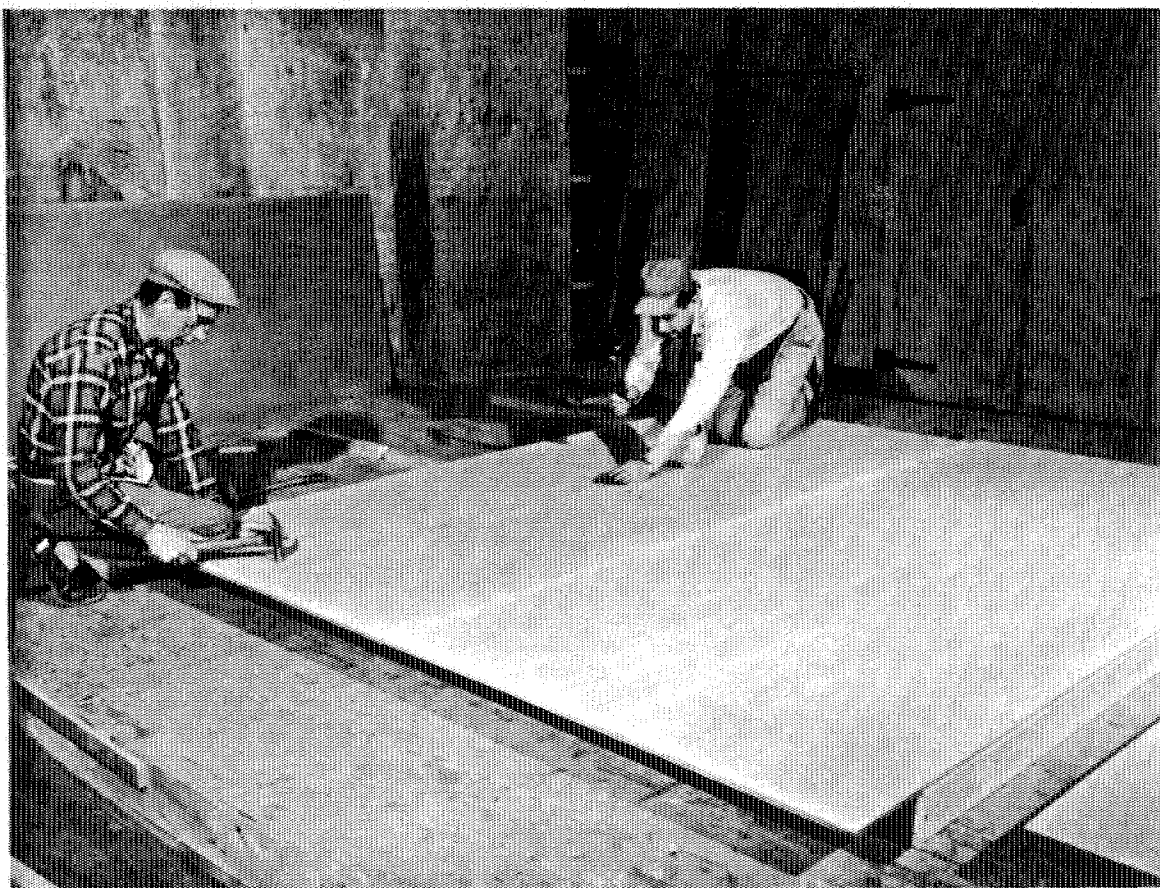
The floor of the Mark III house used stressed skin panels.
